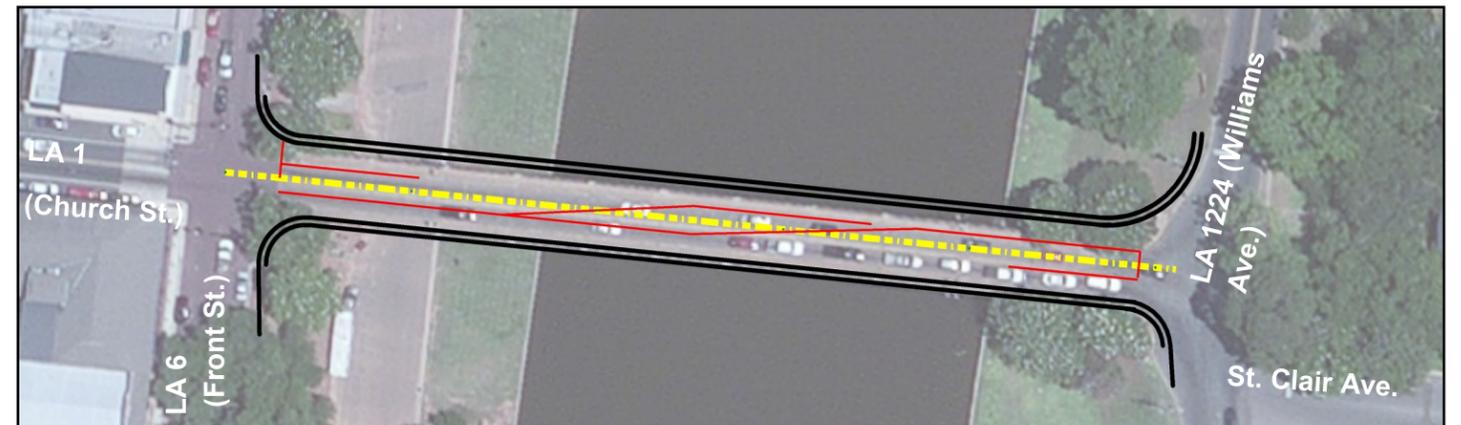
Proposed Cane River Replacement Bridge on Existing Alignment
